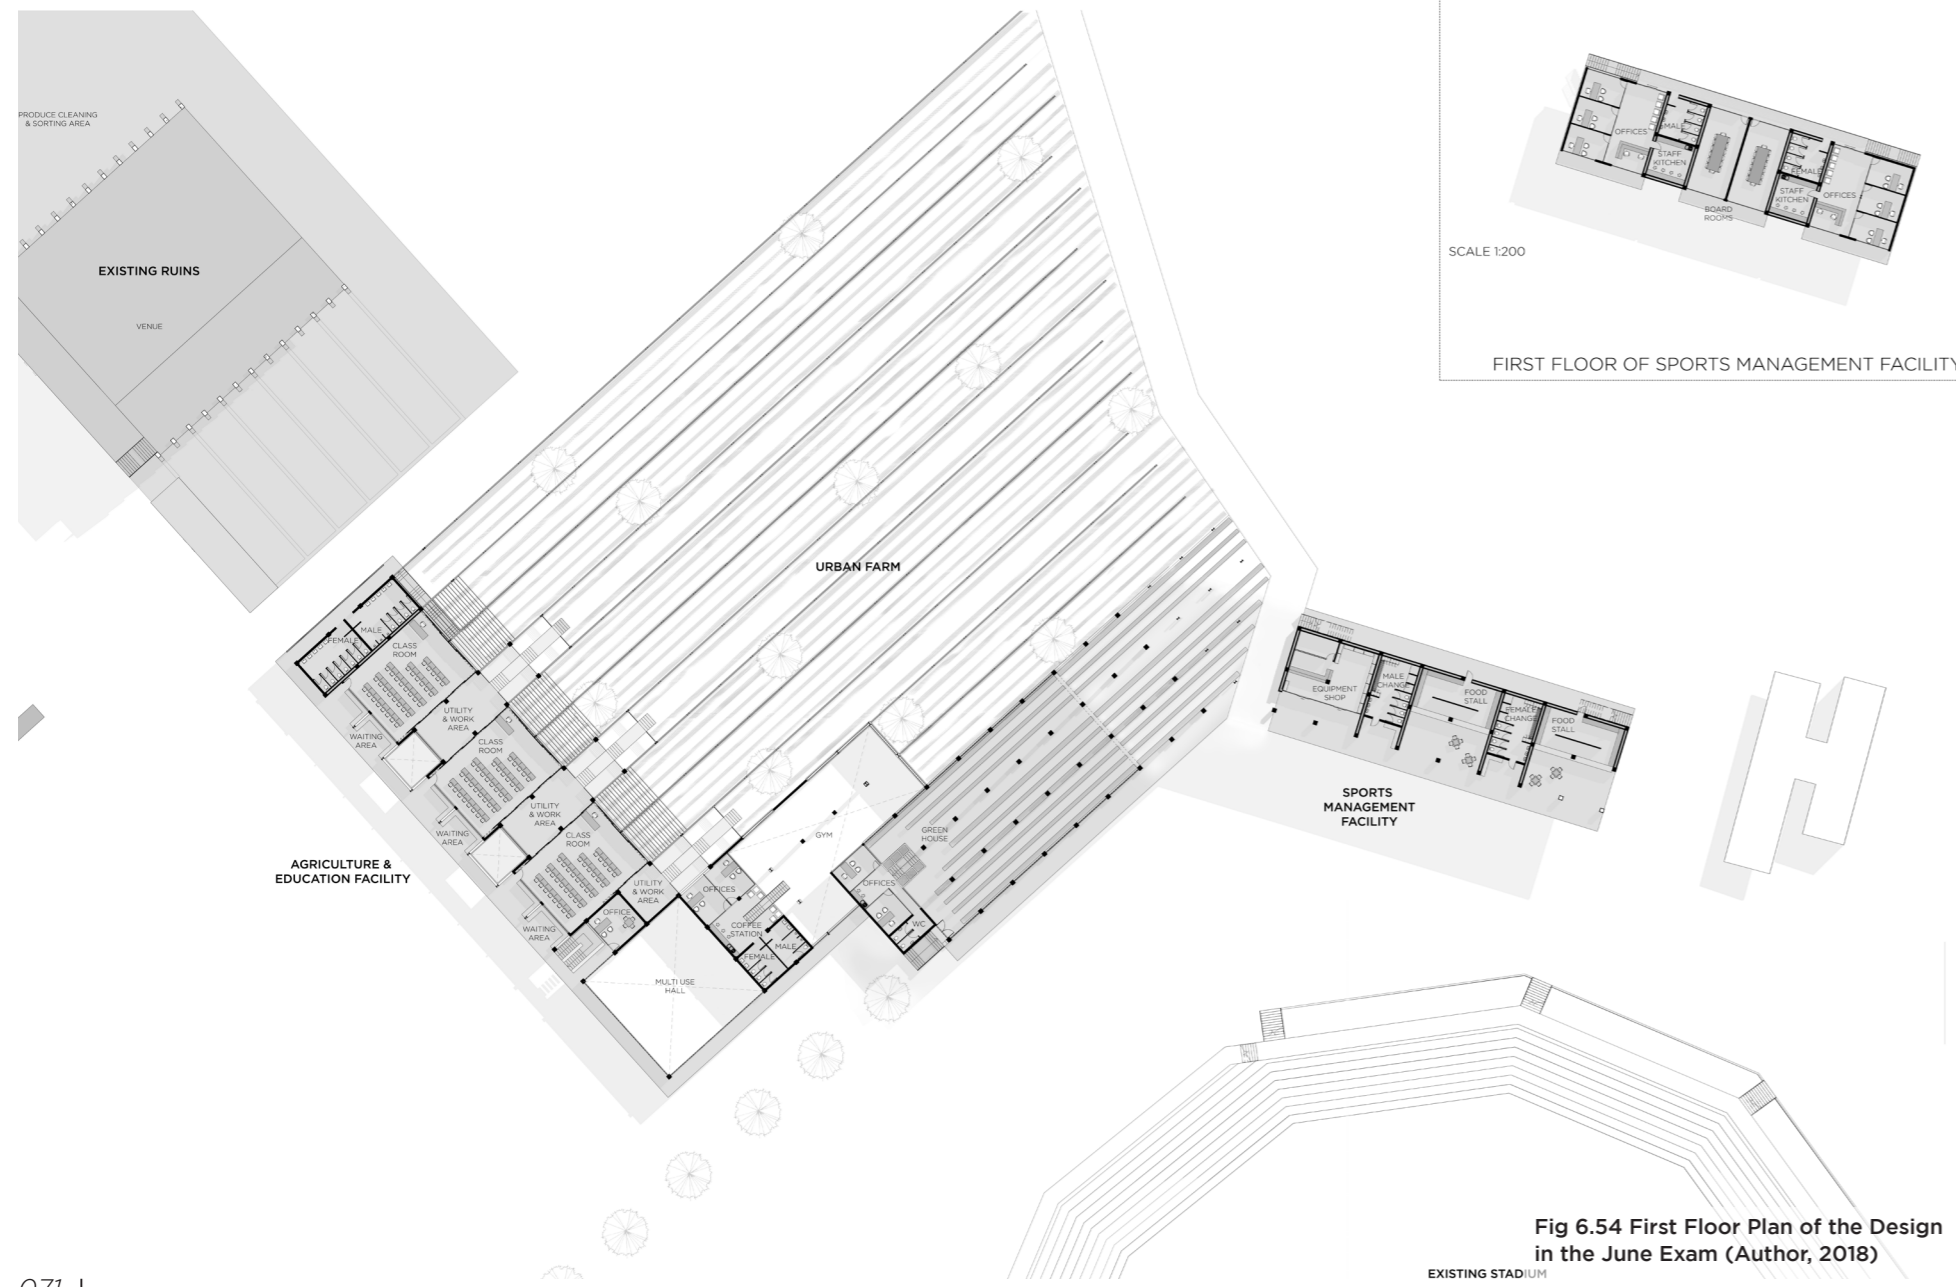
First Floor Plan of the Design in the June Exam (Author, 2018)
